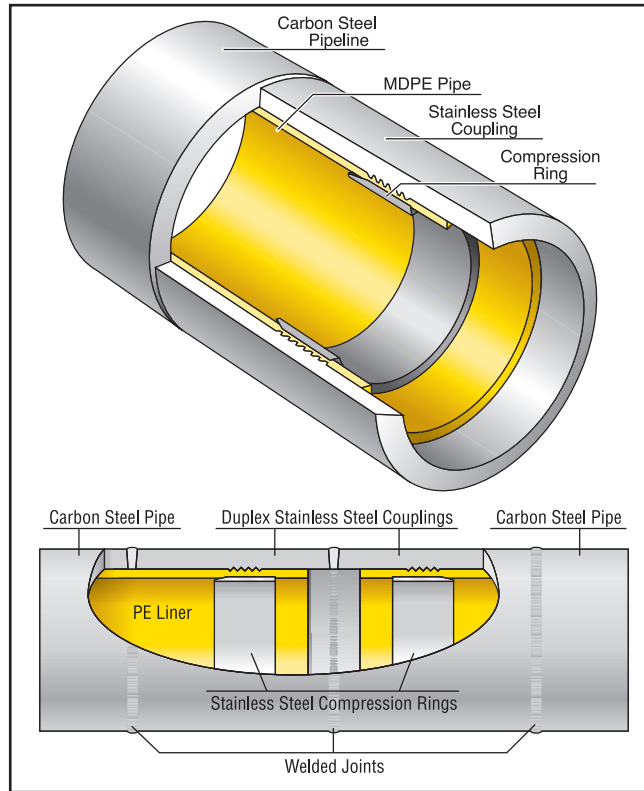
End of pipeline after short stainless section is welded on, and PE liner and compression ring seal are installed (A). Stainless sections are then welded together to complete the pipeline connection (B).
